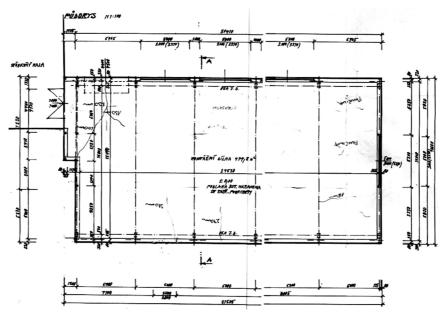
Scheme of cracks in the floor of the storage hall in Frýdek-Místek
